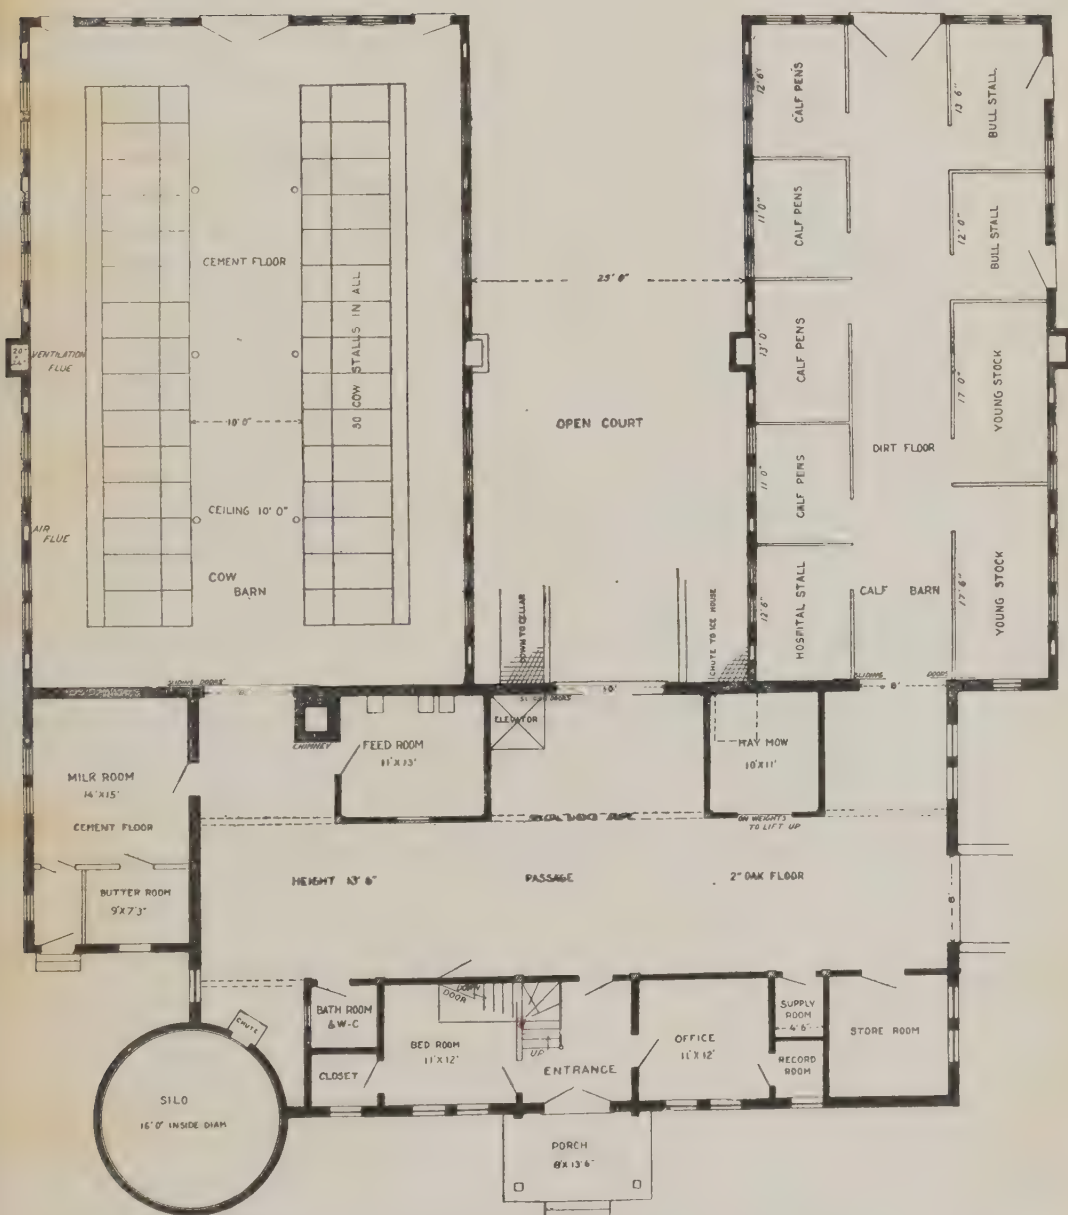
Ground plan of Kentucky Station dairy barn.
